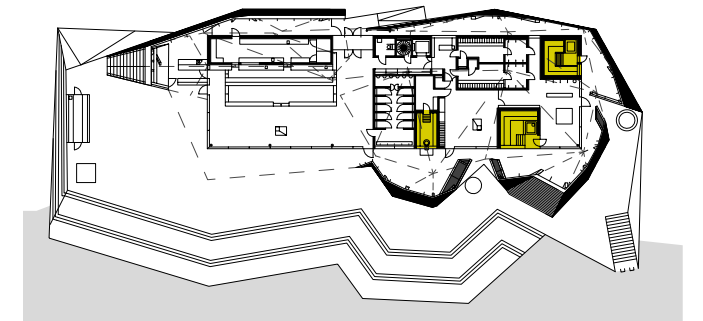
Floorplan with site context. Image by author from Avanto Architects.
